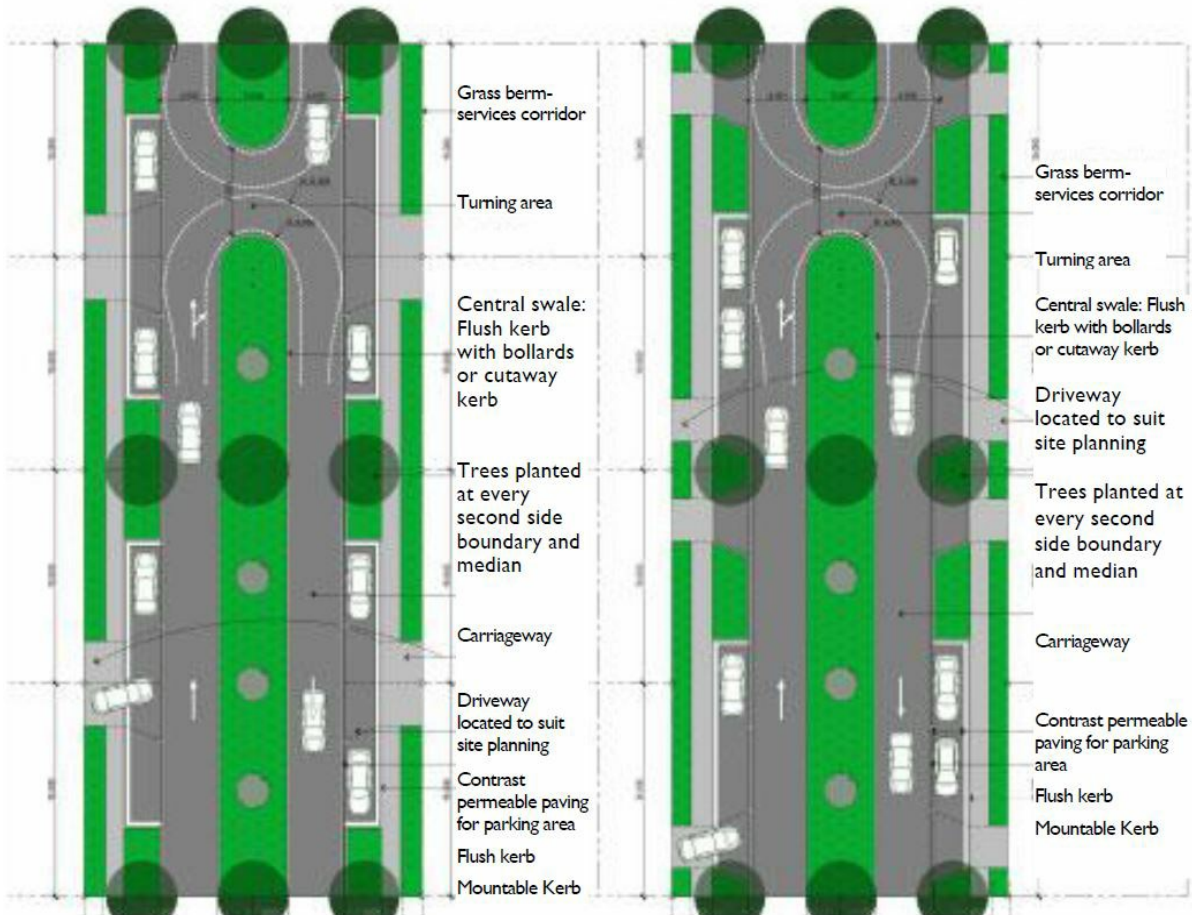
Collector Road Plans: Combined driveways on left and separated driveways to the right.
